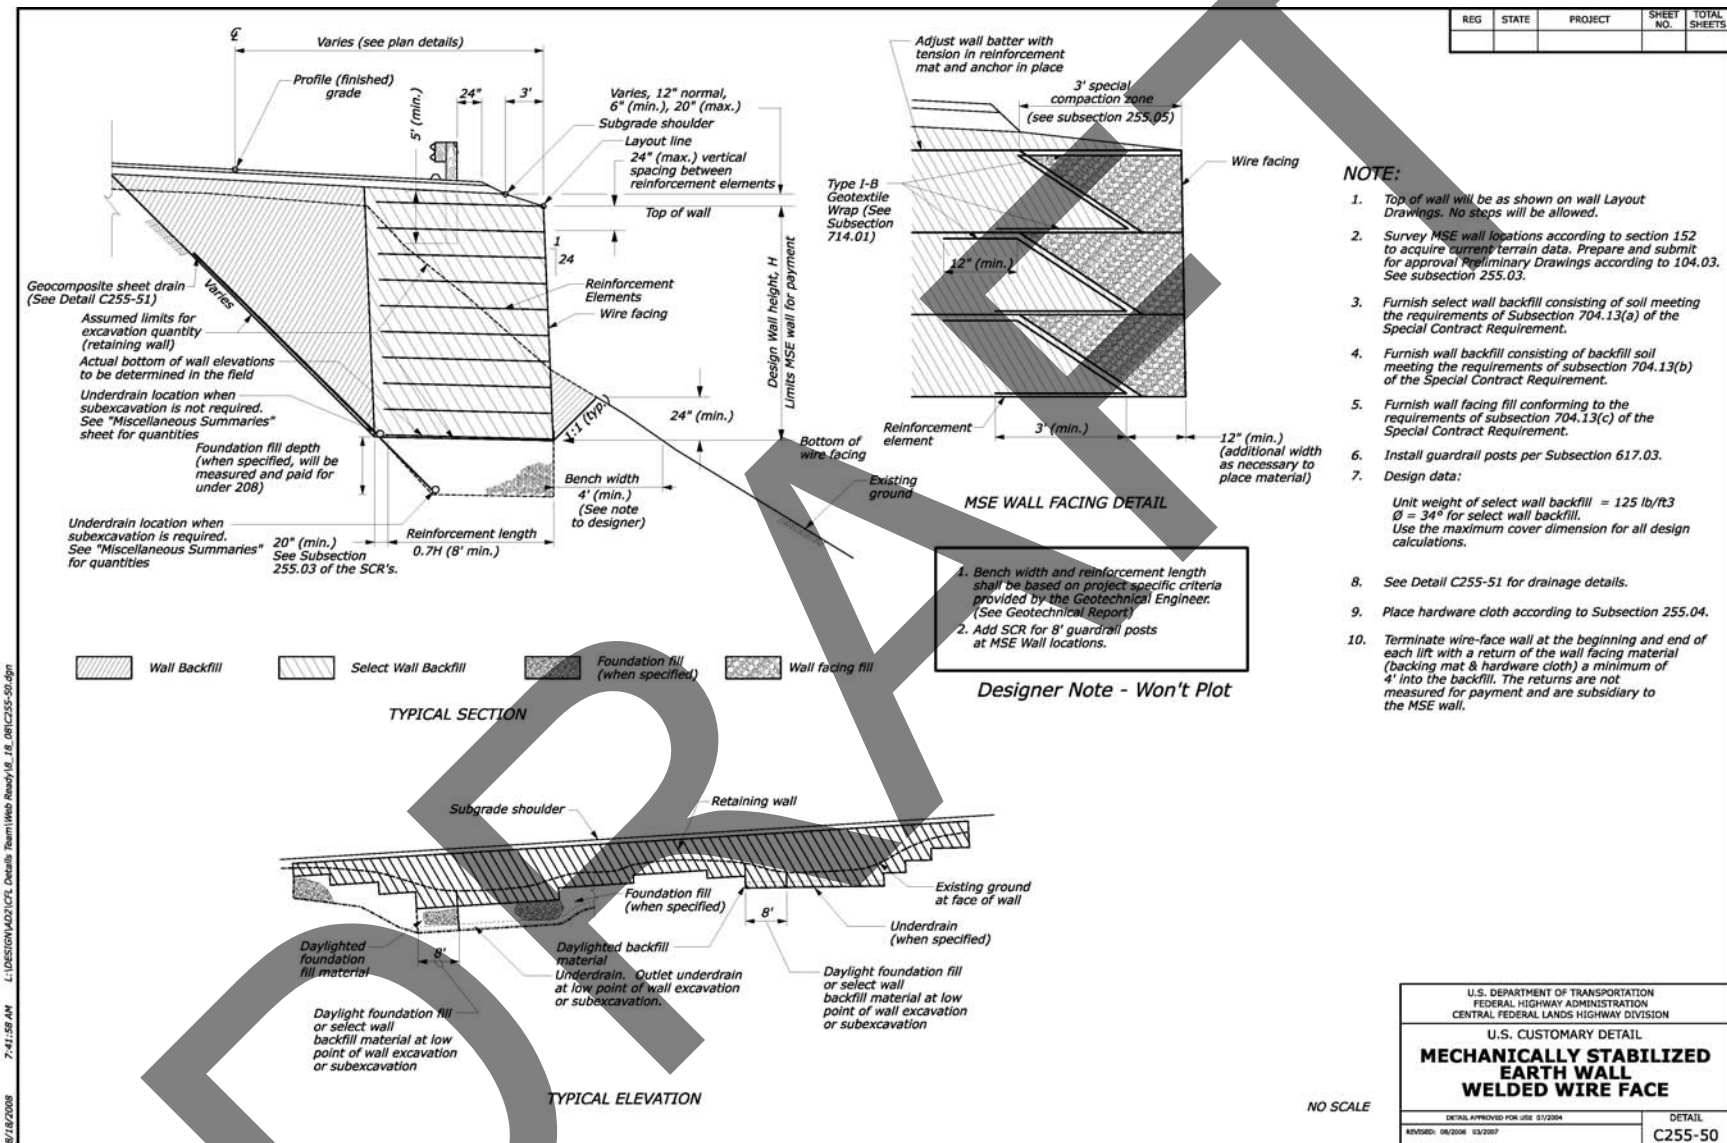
Schematic. CFLHD's Standard Detail C255-50.
